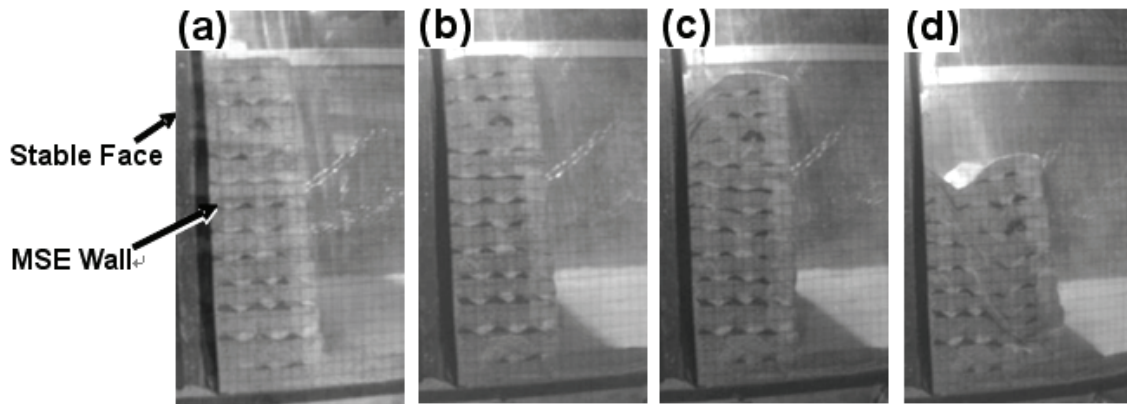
Photographic images from centrifuge: (a) Initial condition (gravity); (b) Working Stresses (10g); (c) Before Failure (41g); (d) Failure condition (41g) (Woodruff, 2003)
